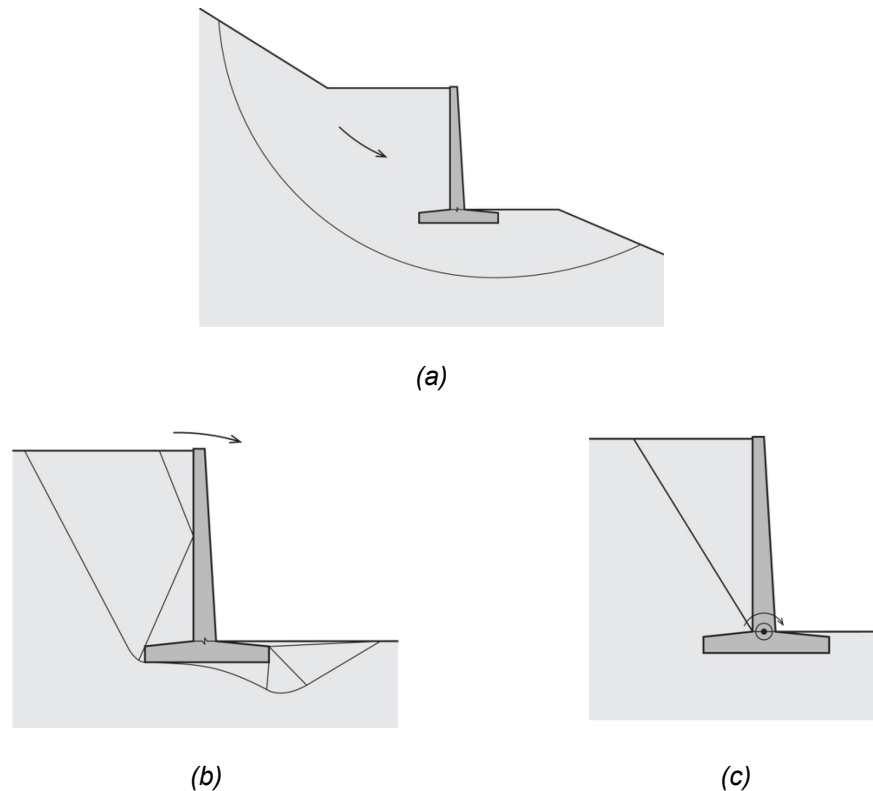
Types of failure: (a) global soil failure, (b) soil local failure, and (c) structural (bending) failure.
